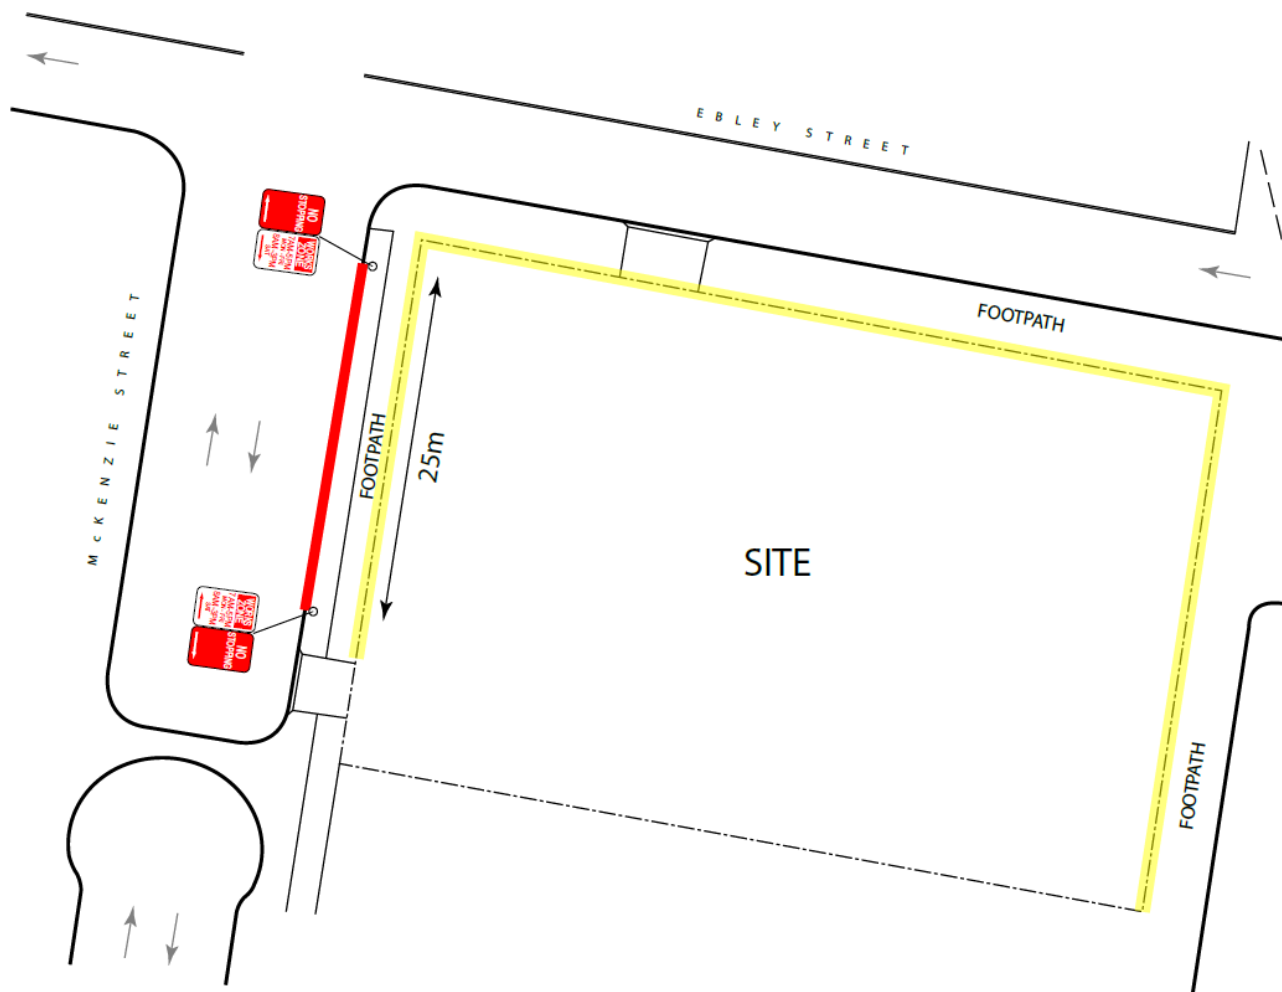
73-89 Ebley Street – Proposed Construction/Works Zone
